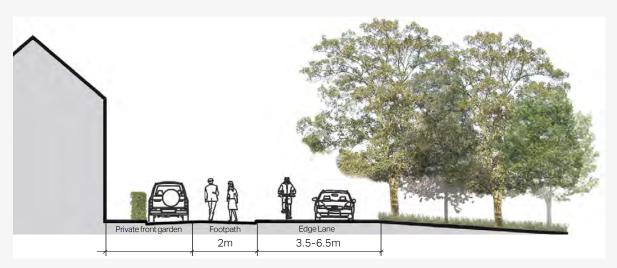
Cross-section to illustrate some dimensions for edge lanes.
